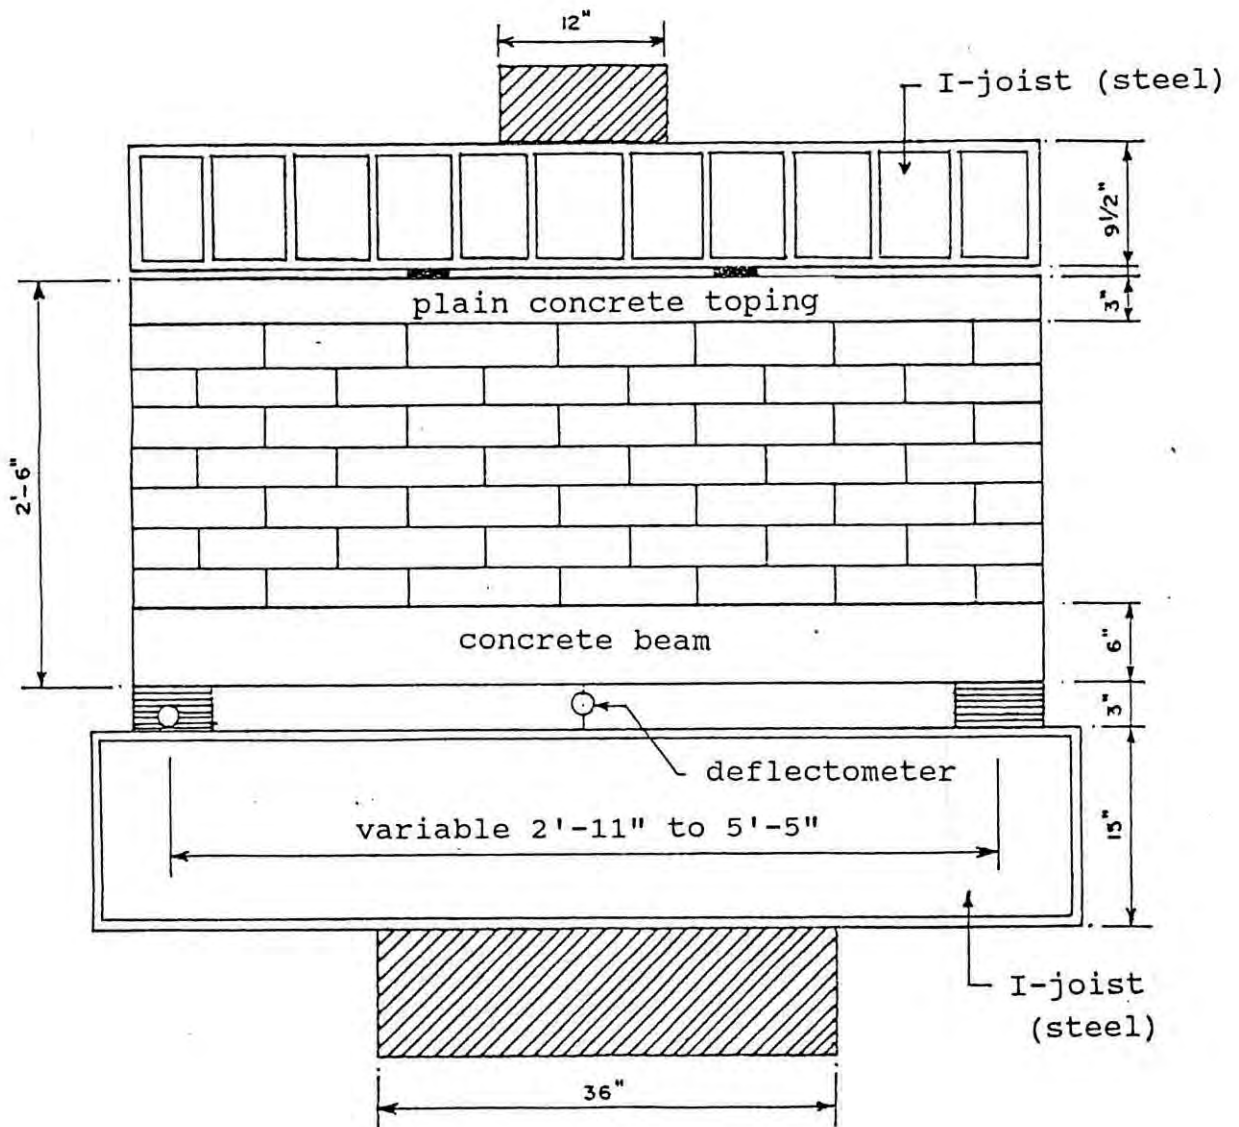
Typical Testing Arrangement for Composite Wall-Beam
